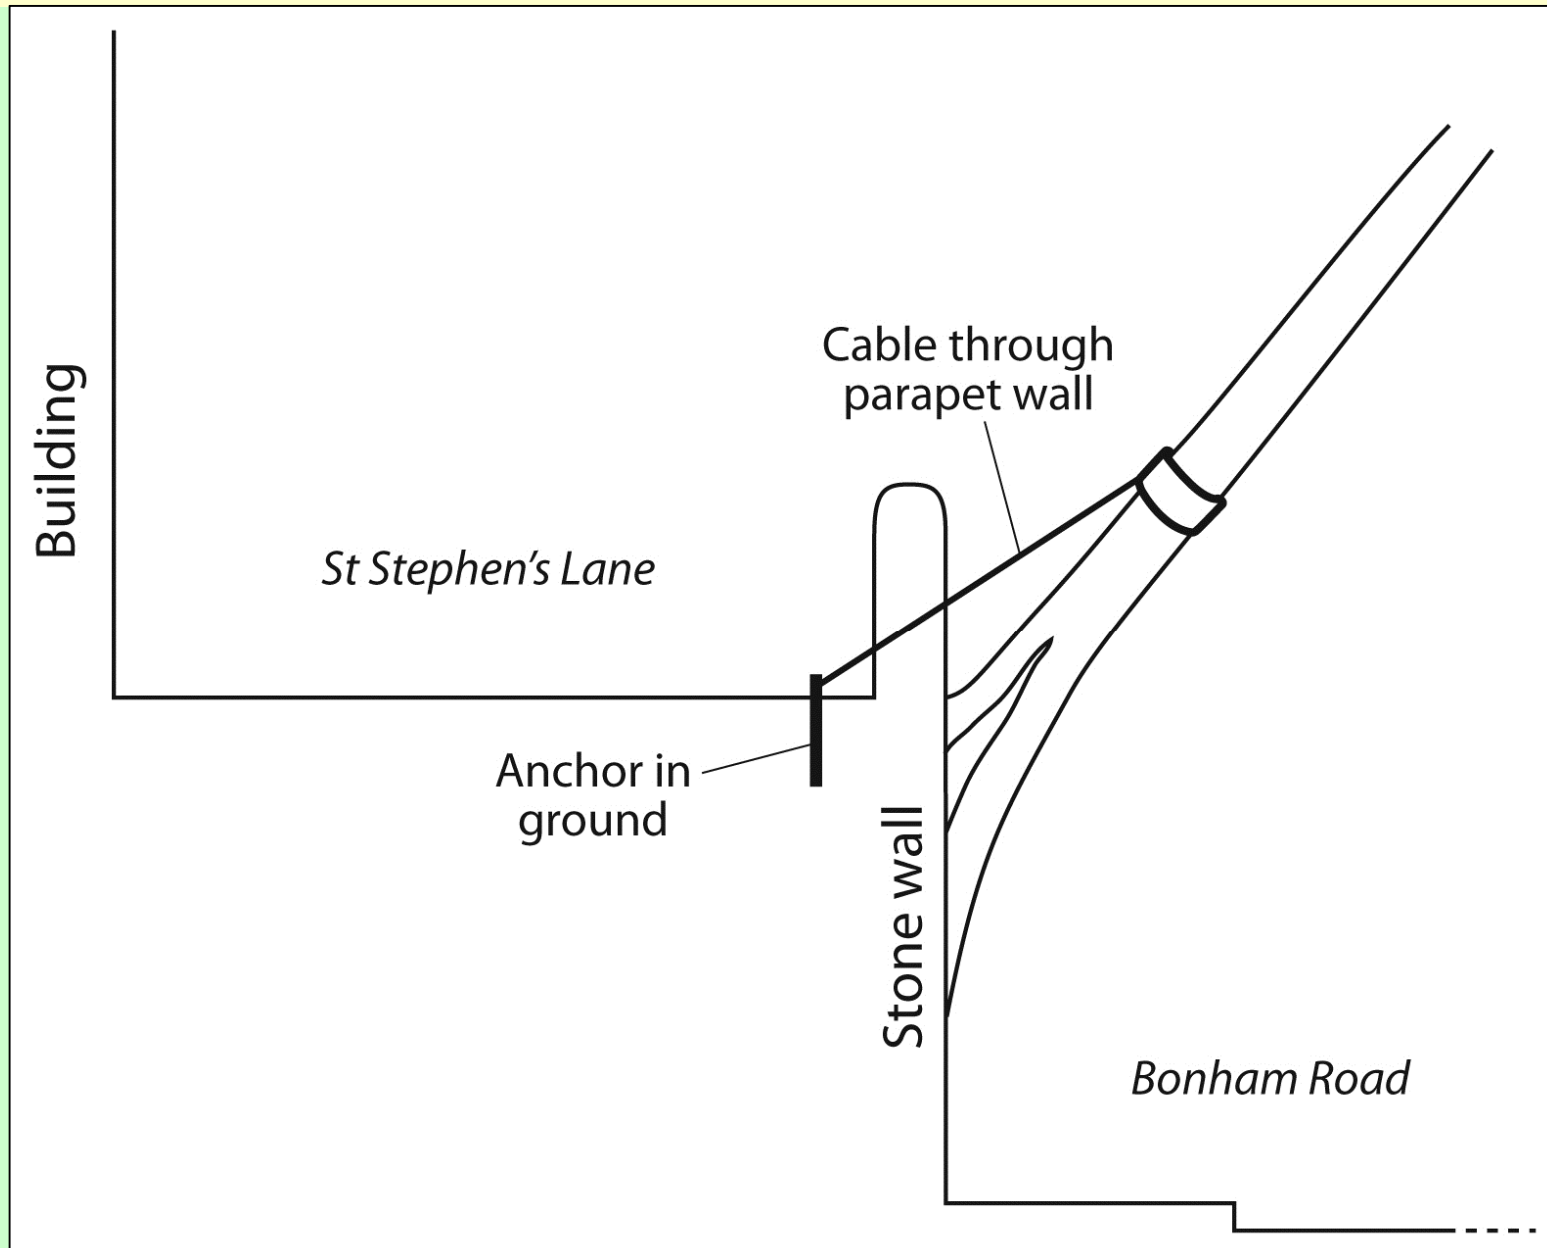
Method D: Proposed temporary cable bracing to be anchored in the ground at St Stephen's Lane.
